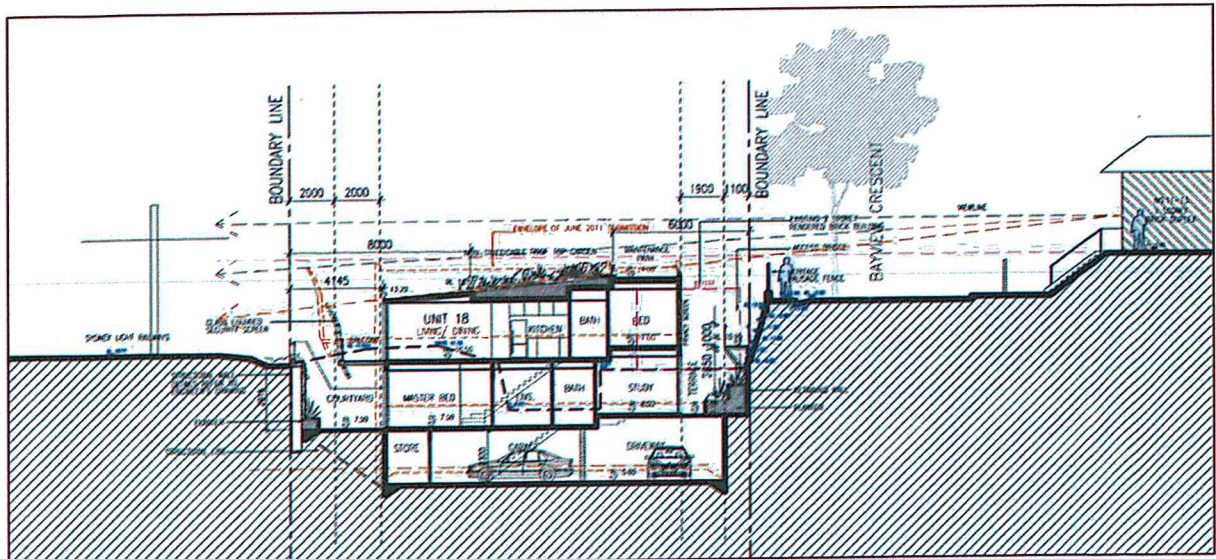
Originally proposed 1.0 metre high balustrade to northern edge of elevated pedestrian walkway (source: tony owen partners Drawing No: A301 Rev B4, dated 11.09.2012).
